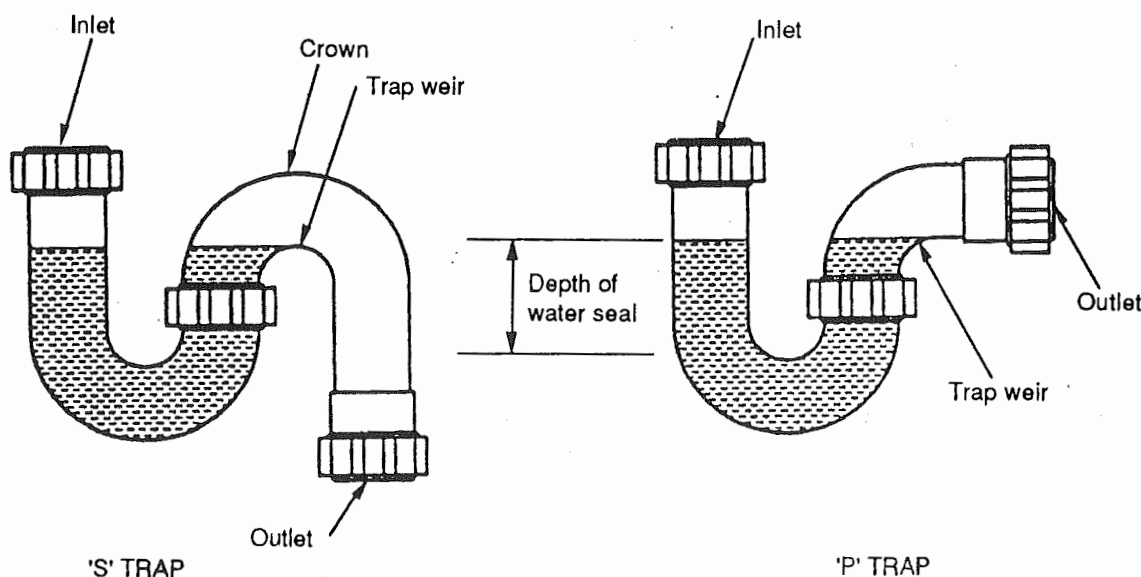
EXAMPLES OF FIXTURE TRAPS
